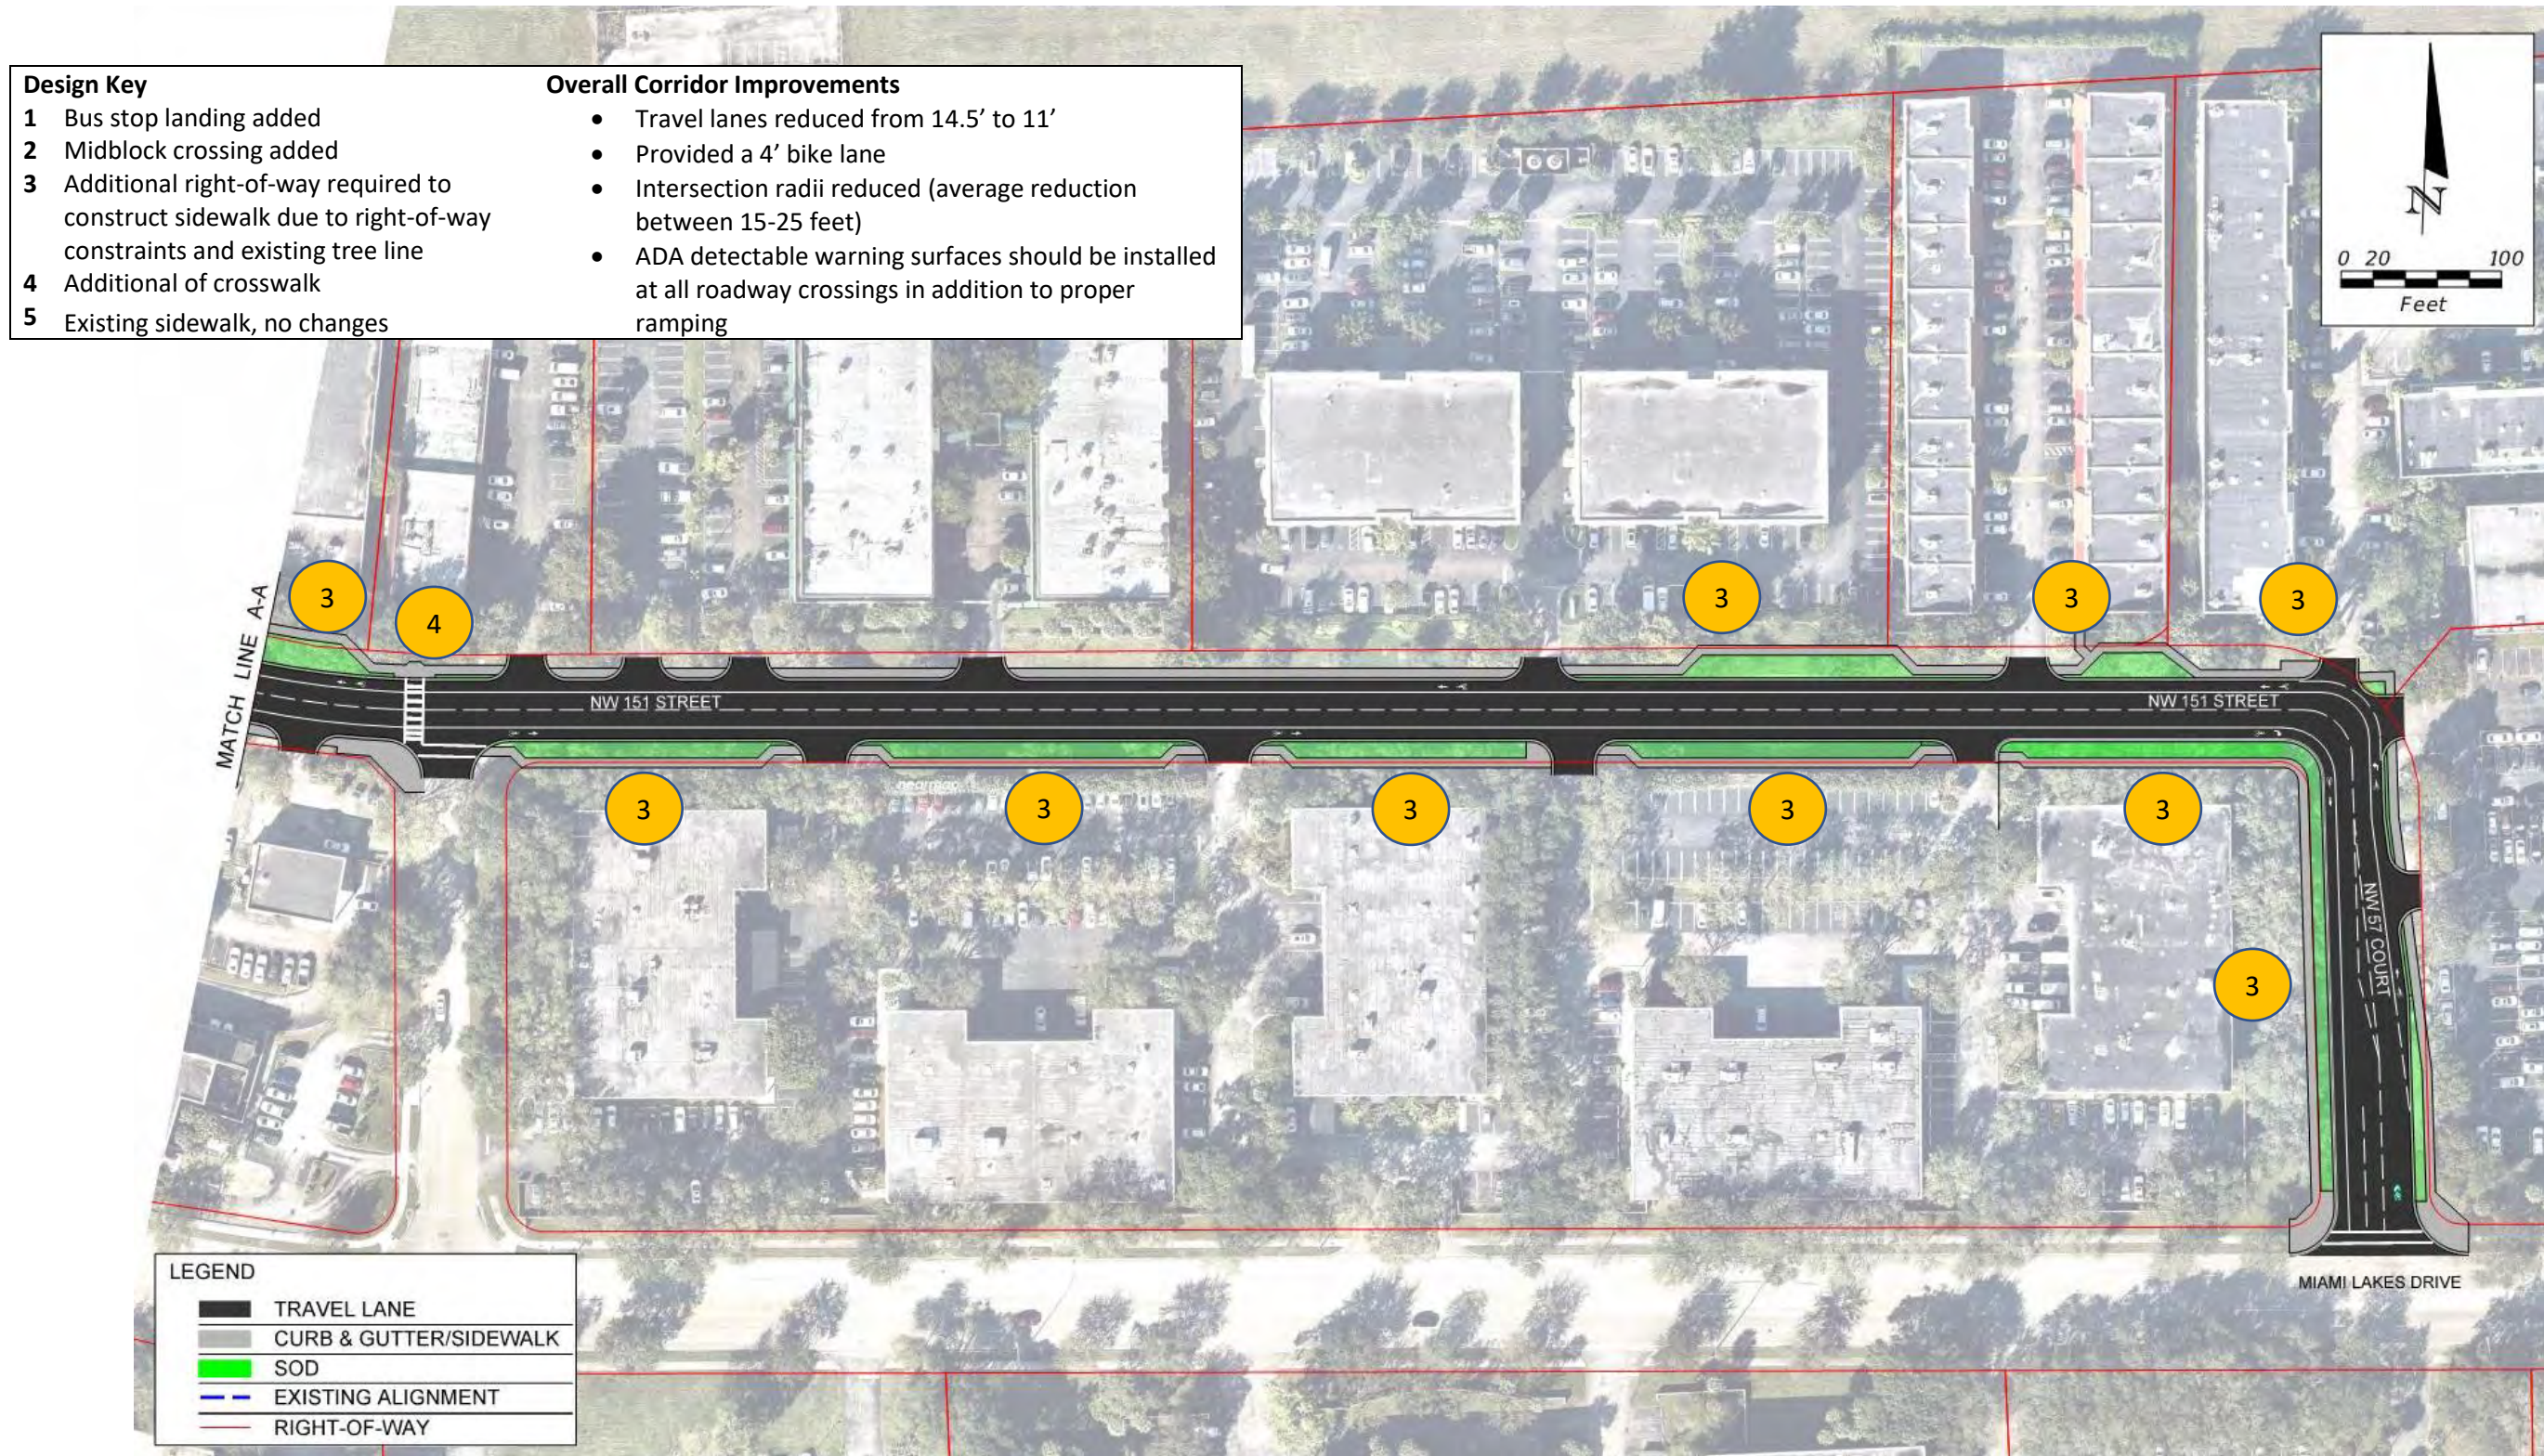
Civic Street - NW 151/NW 153 Street Proposed Concept (A-2)
